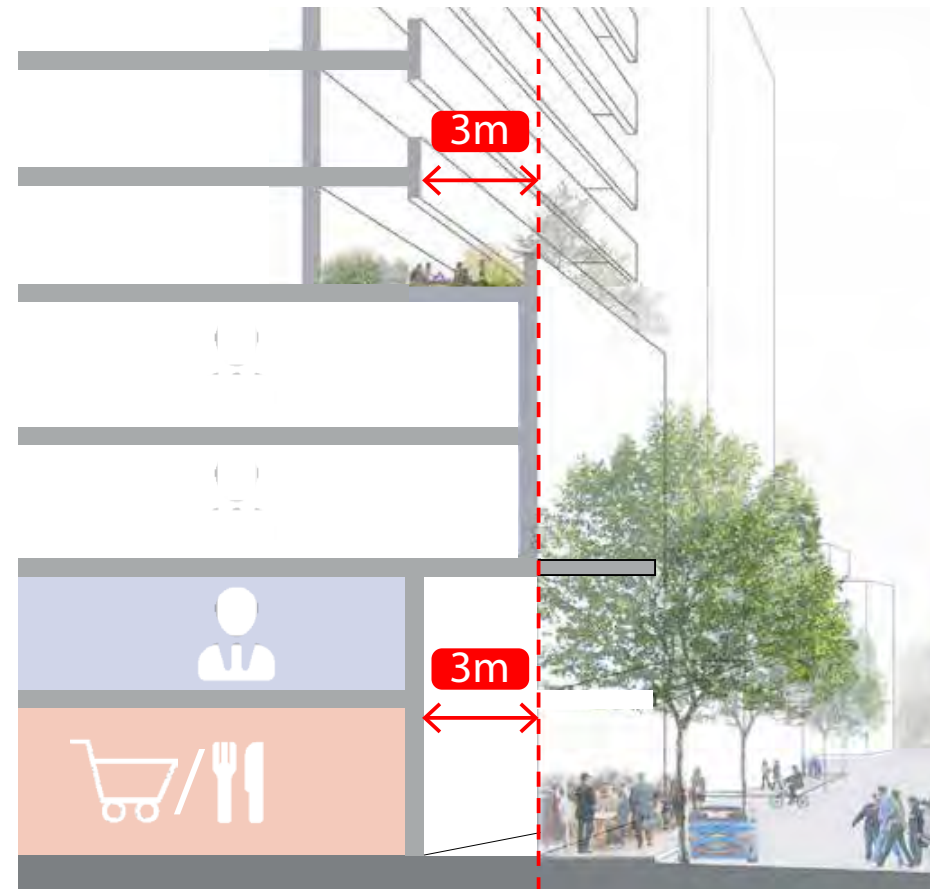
Figure 3.12.2 - T1, 9 Atchison Street
